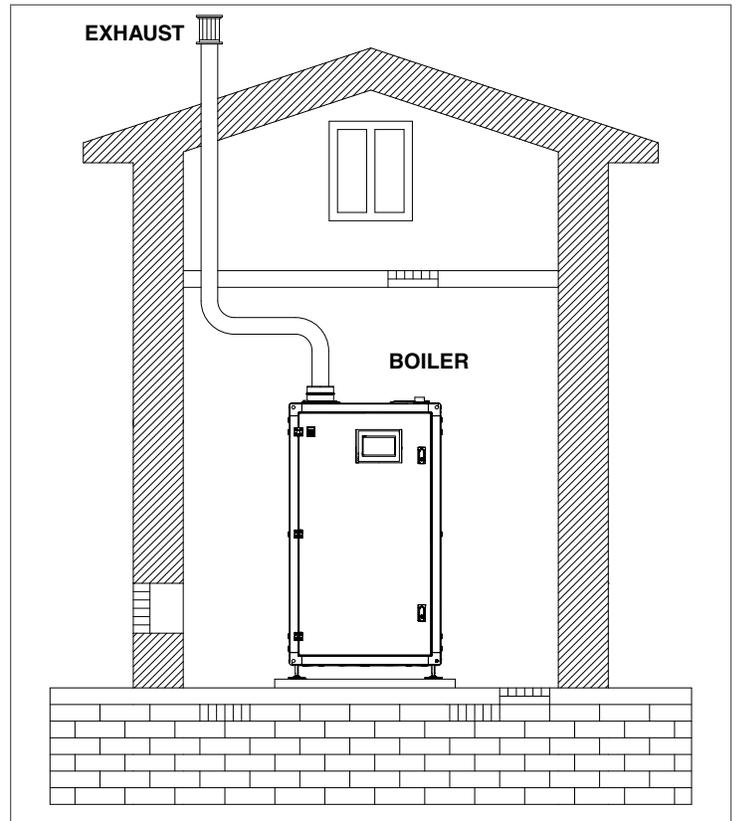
All Combustion Air From Outdoors - Inlet Air From Ventilated Crawl Space and Outlet Air to Ventilated Attic
